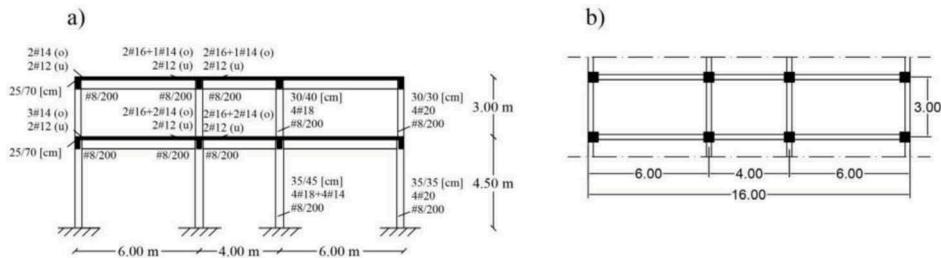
Schematic representation of the (a) cross-section with reinforcement details and (b) plan view of the reference MRF building used for the study (personal communication Kappos A and Panagopoulos G).
